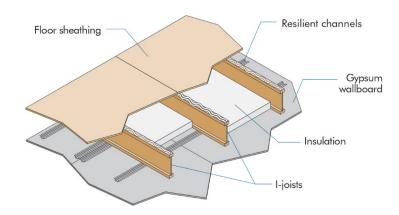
ONE-HOUR FIRE-RESISTANCE-RATED FLOOR-CEILING ASSEMBLY (Ceiling—one layer of ³/₄-inch Type X gypsum wallboard)
